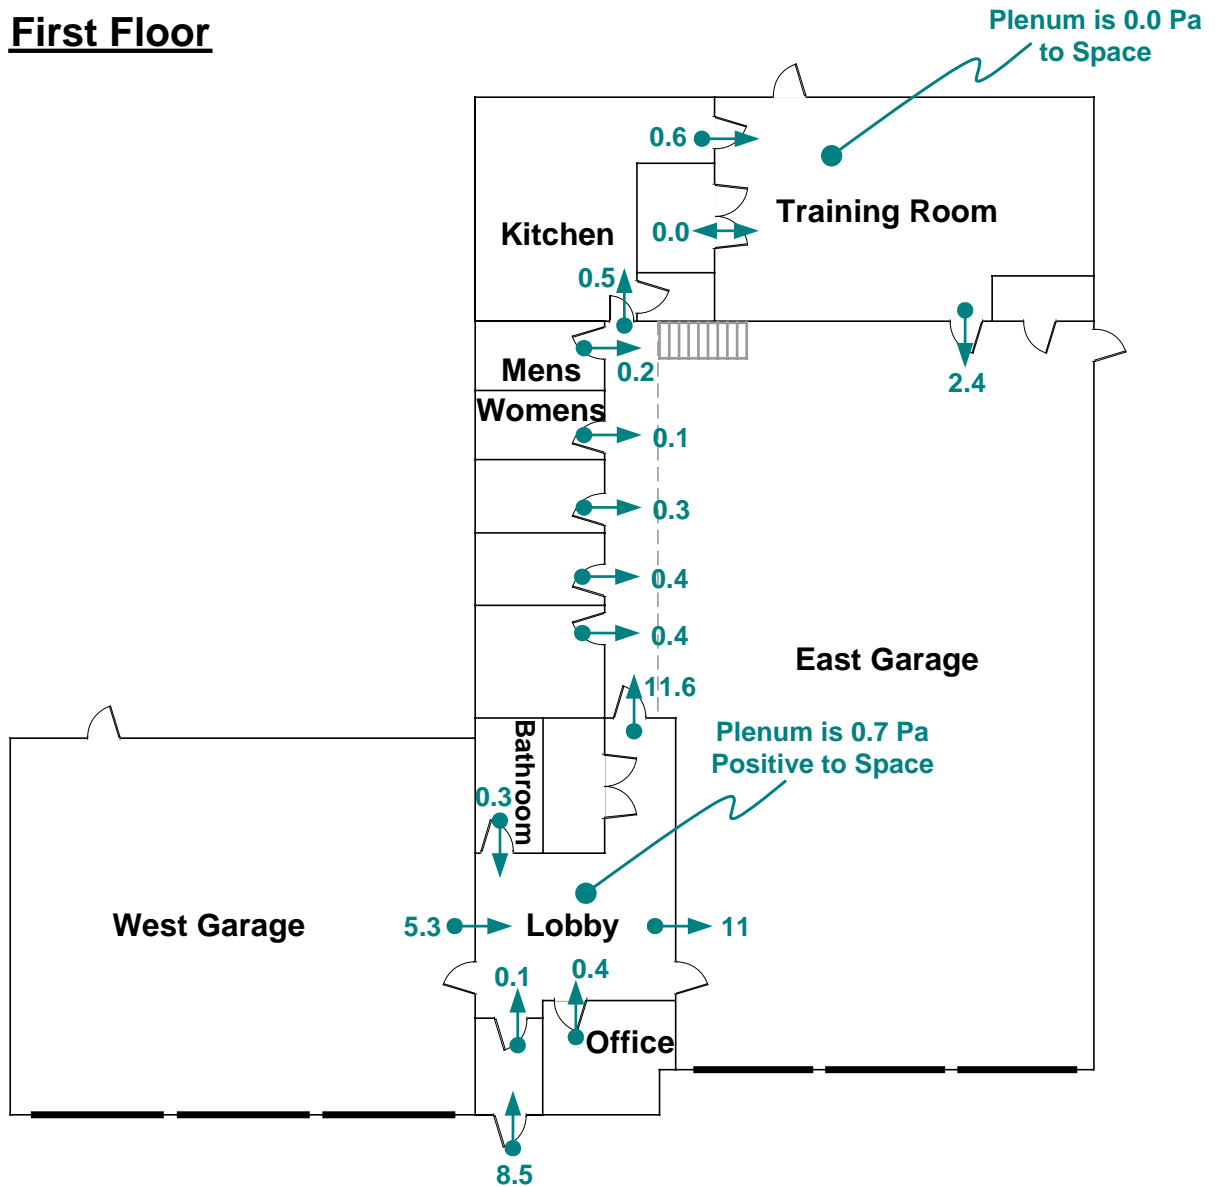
First Floor Pressure Differences between Rooms with East Garage Exhaust On (EF-2)
